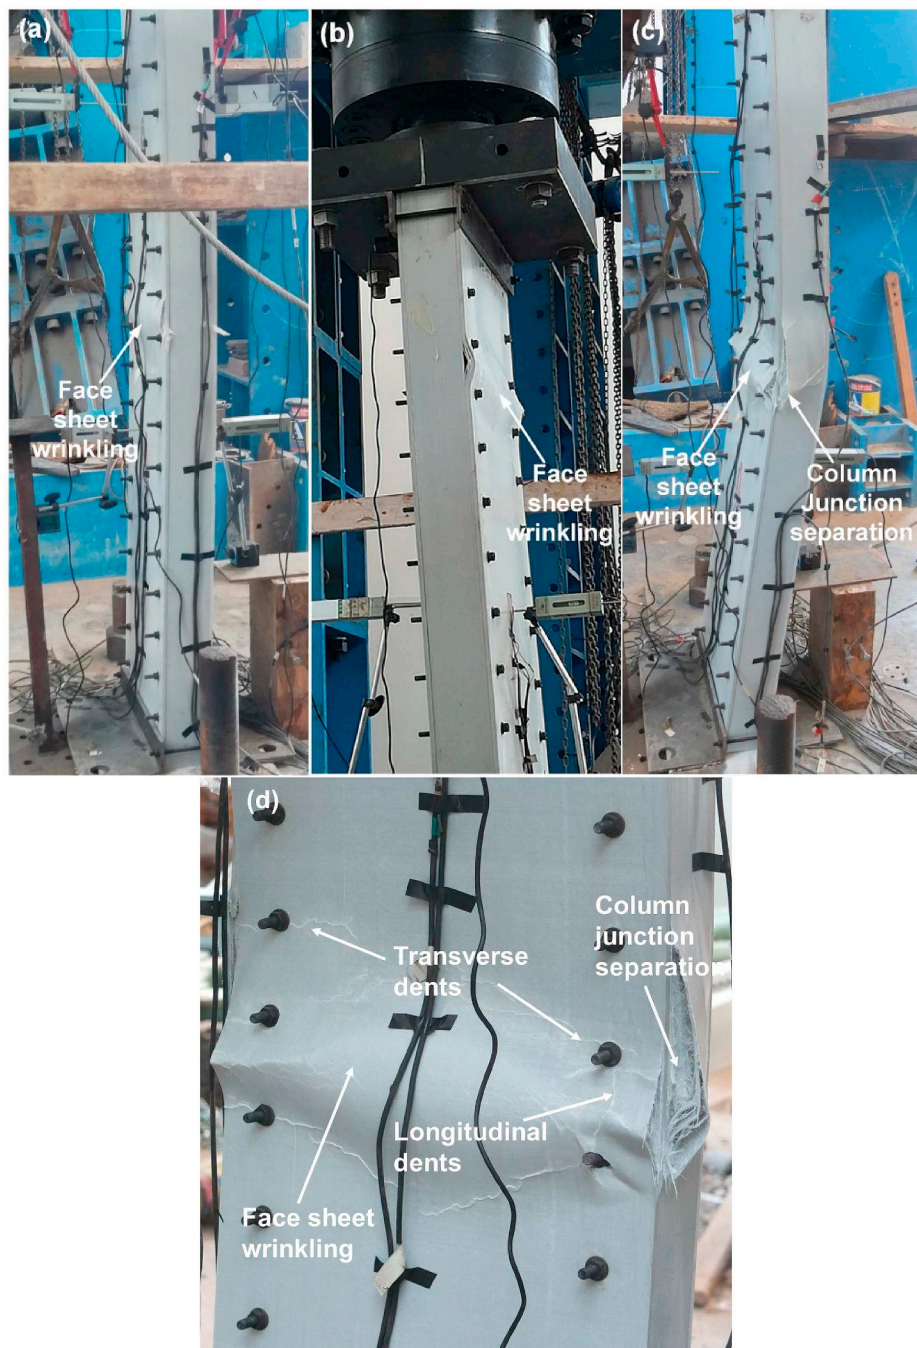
Failure modes of specimen MB-2: (a) back face sheet wrinkling; (b) front face sheet wrinkling; (c) further back face sheet wrinkling and column junction separation; (d) longitudinal and transverse local damages near bolt hole regions.
